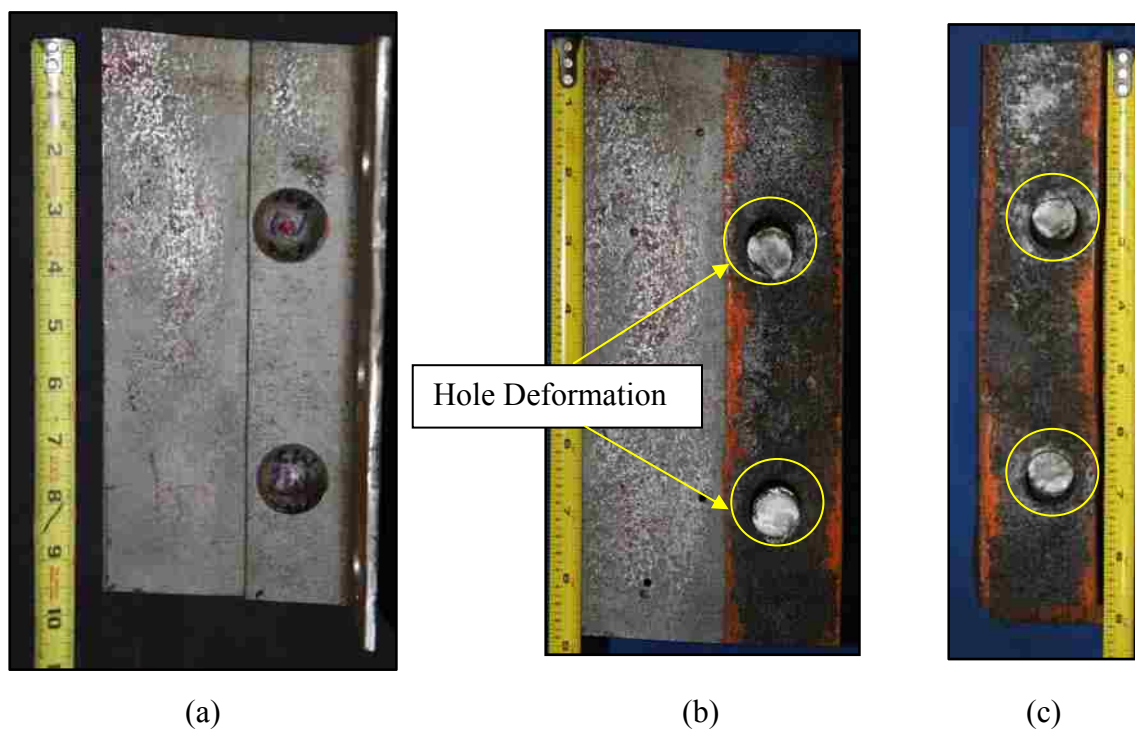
West Guardrail Rivet Hole Deformation (a) Before Testing (b) West Angle After Testing (c) West Channel After Testing- Specimen 2R
